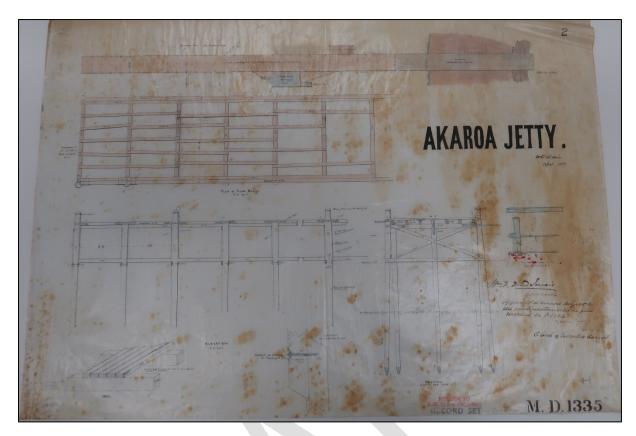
Plan, section, and elevation of Akaroa Wharf (Wellington Archives New Zealand.
